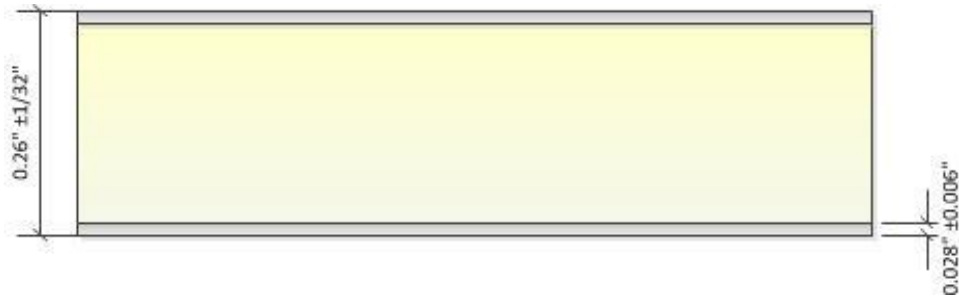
1/4-in. GoBoard® Thickness Dimensions
